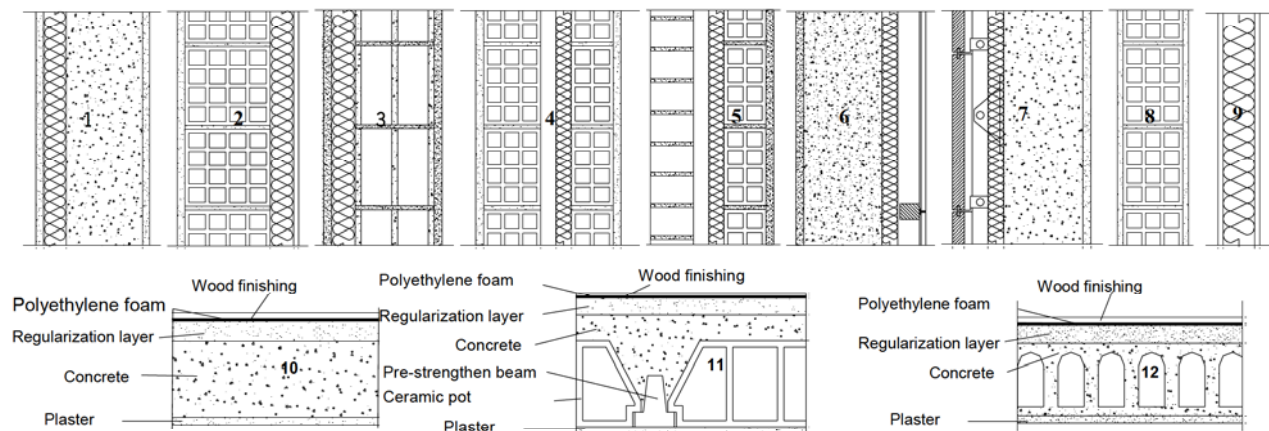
Vertical cross-section of some of the construction solutions of the buildings walls and floors (external and partition elements)
